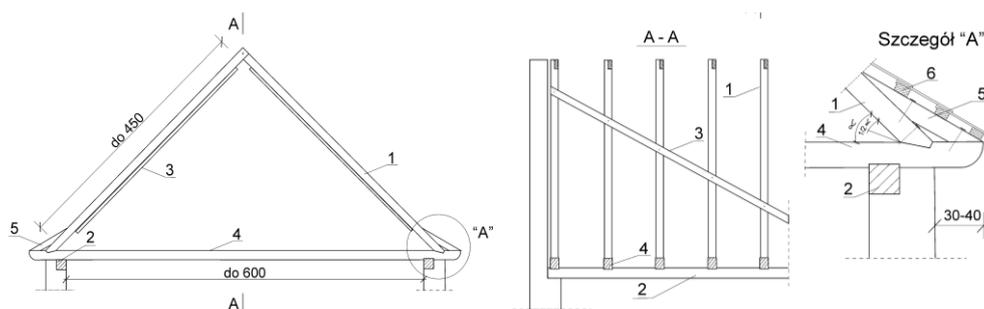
Rafter-beam roof: 1 - rafter, 2 - plate (torsel), 3 - wind brace (wind beam), 4 - joist (beams in wooden beam-framed floor), 5 - false rafter (sprocked piece), 6 - lath (batten)
